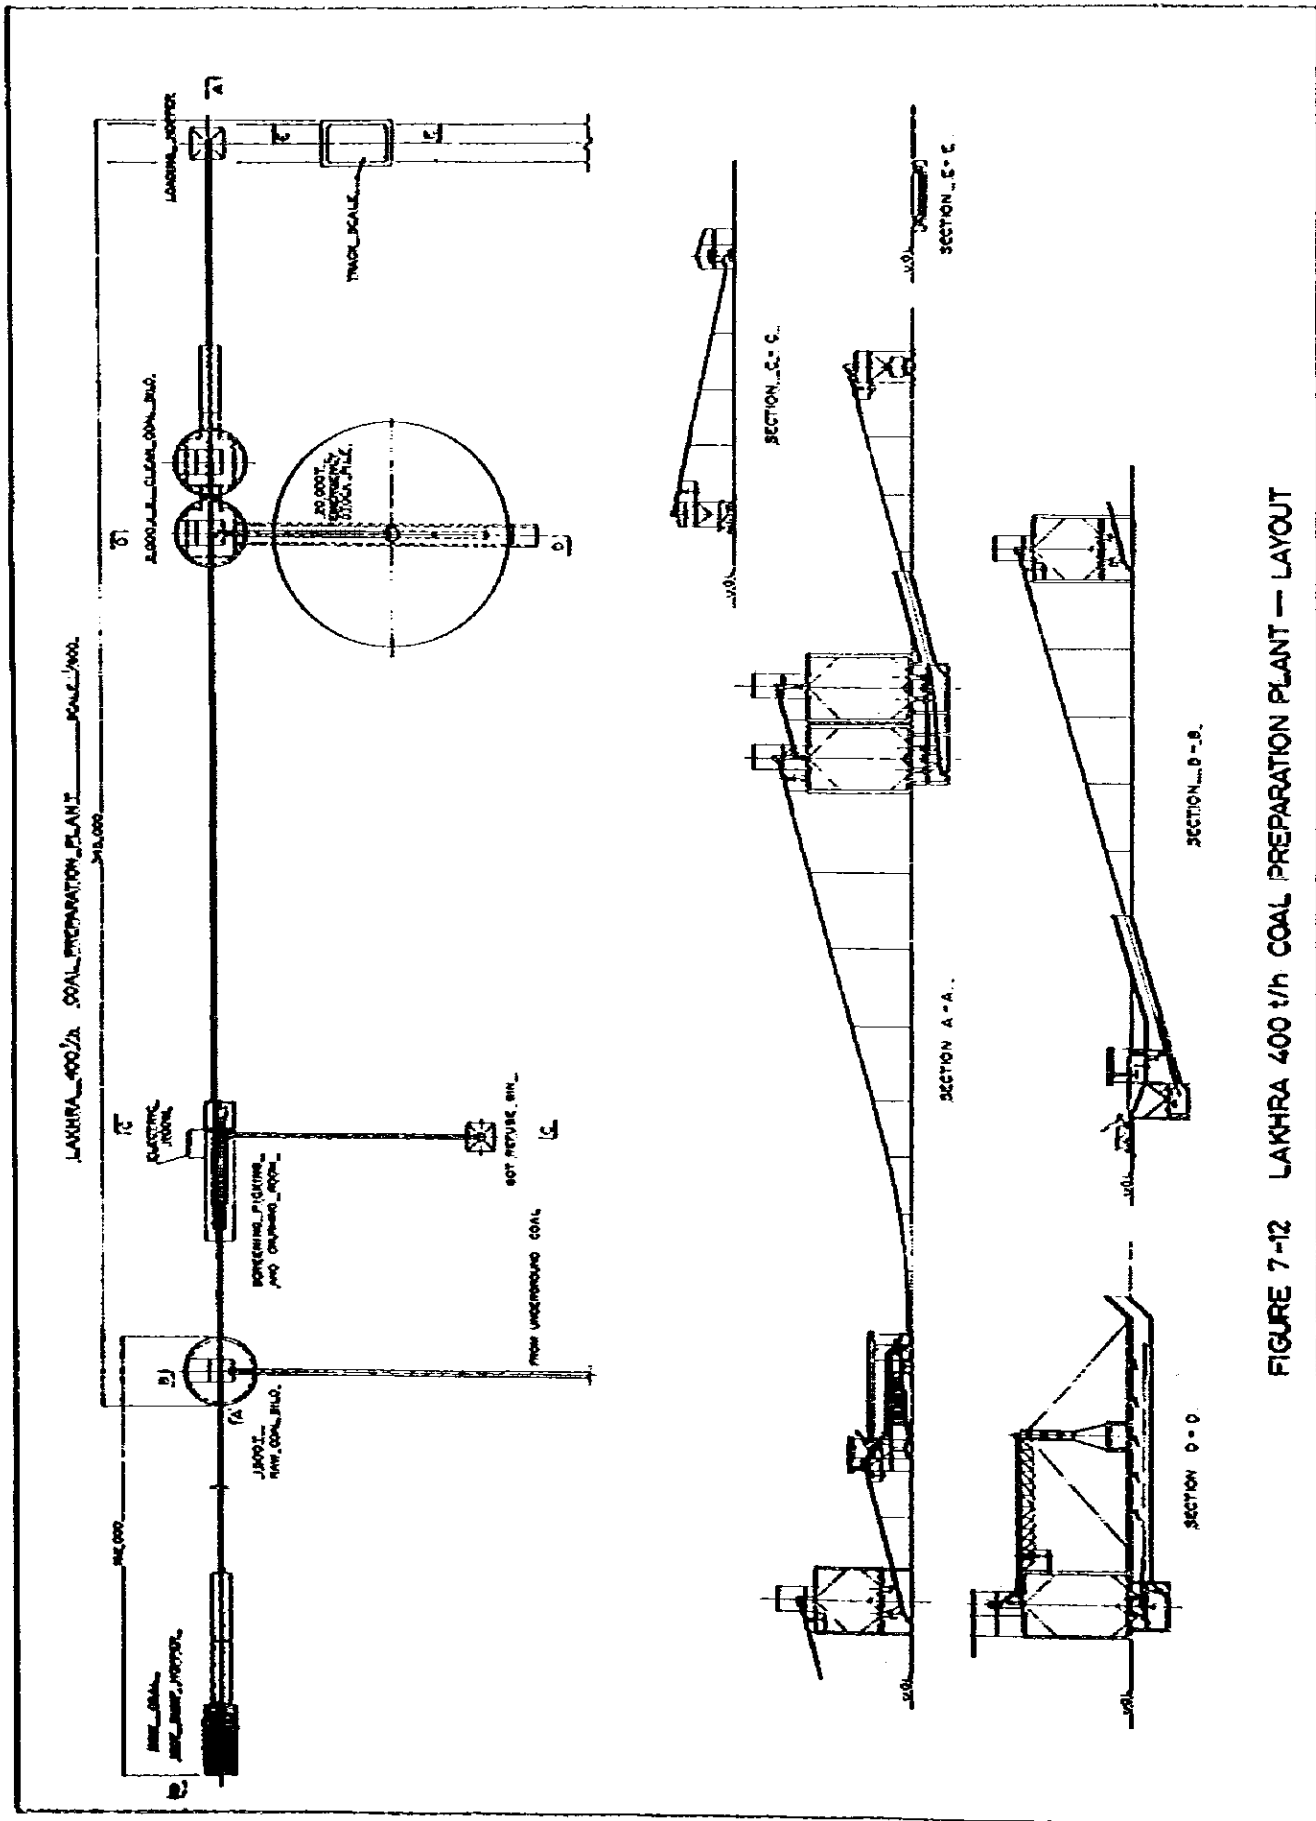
LAKHRA 400 t/h COAL PREPARATION PLANT - LAYOUT
